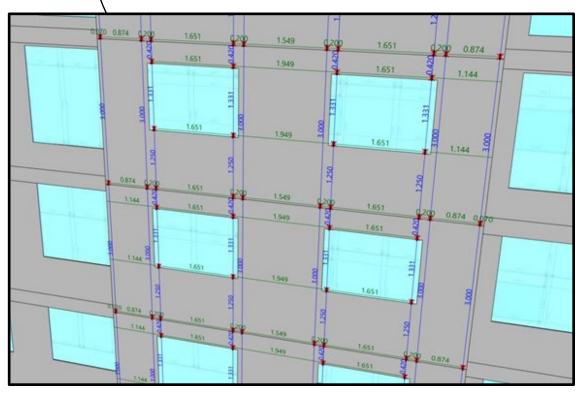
Anchors disposition – SOUTH Perspective View A_Detail.00
